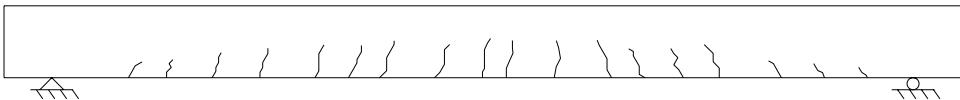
Longitudinal view of intact beam with crack pattern after failure load test.
